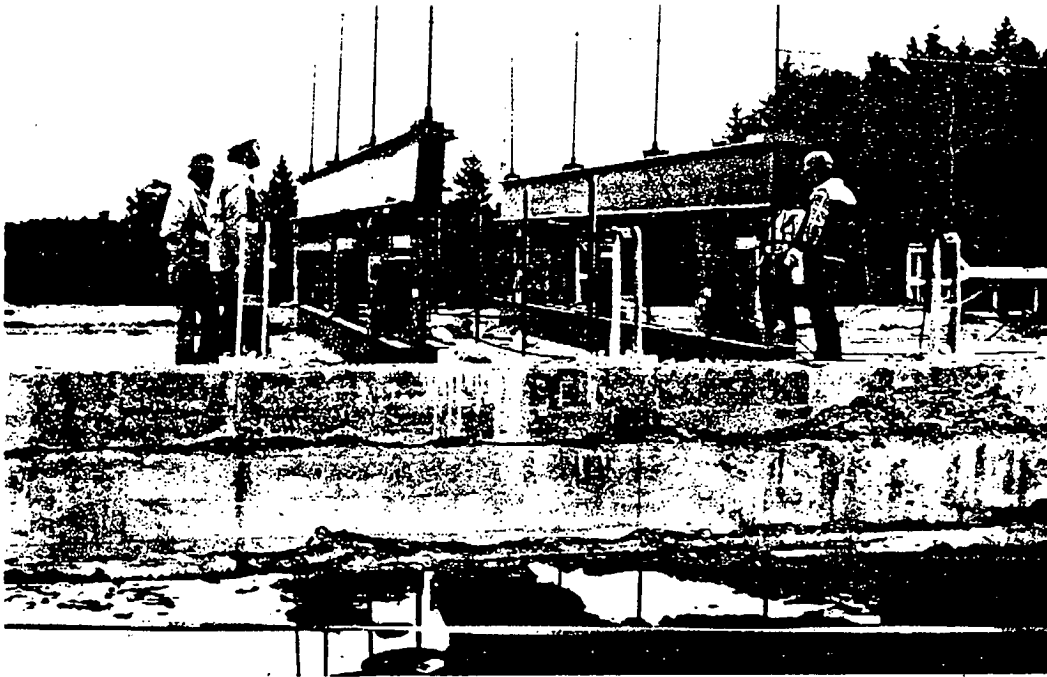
Example showing the use of a hydraulic jack used in load testing of bridges by the New York State DOT.
